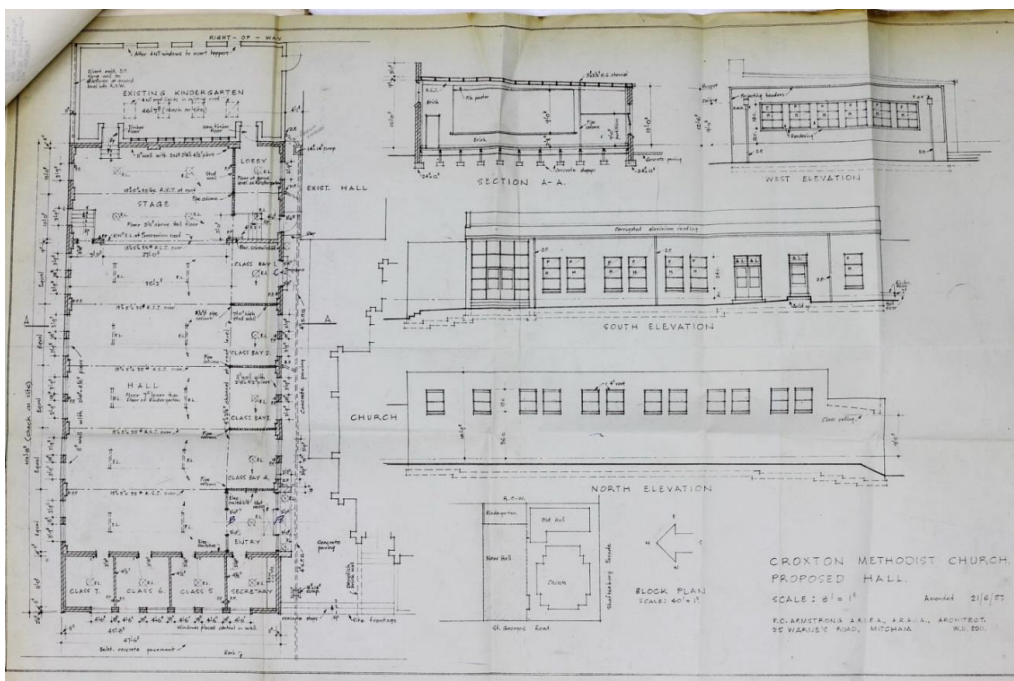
Plans for the 1957 Community Hall. Source: Methodist Sunday School St Georges Road; Croxton, PROV, VPRS 7882/P0001, 2955
